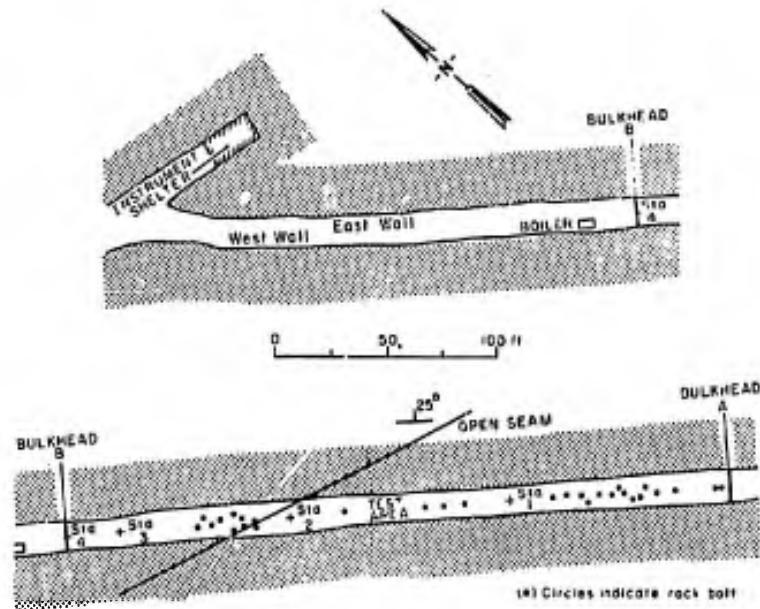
Plan view of tunnel, heat sink test, Mineville, N. Y.
